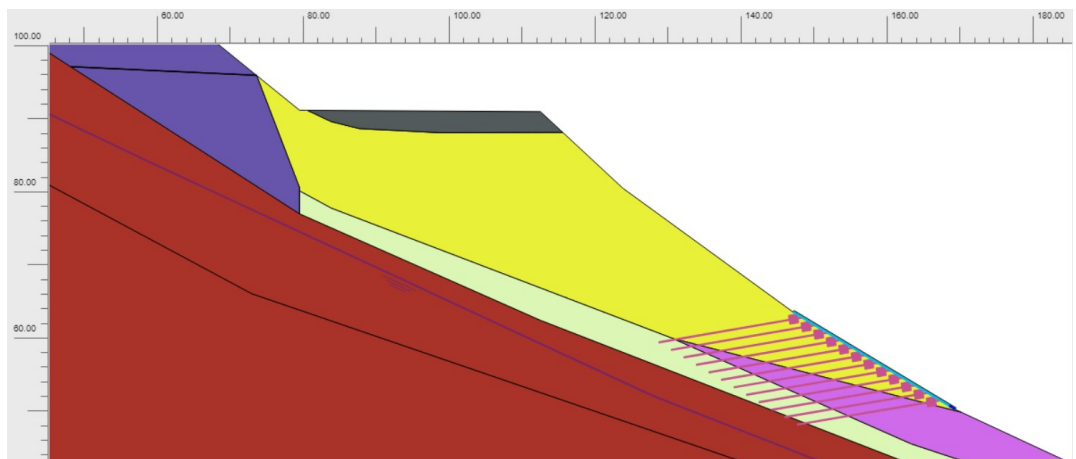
Soil Nail layout with 2.0m spacing and 10 degree inclination
